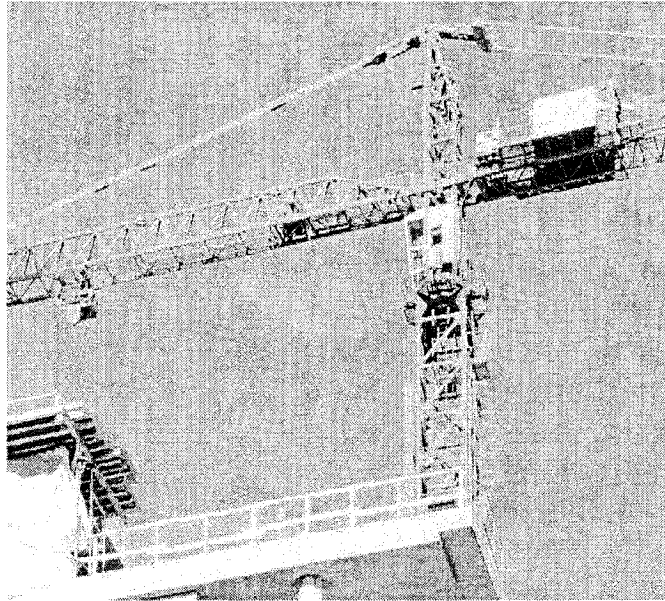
A tower crane constructed with the single lacing space truss structures
